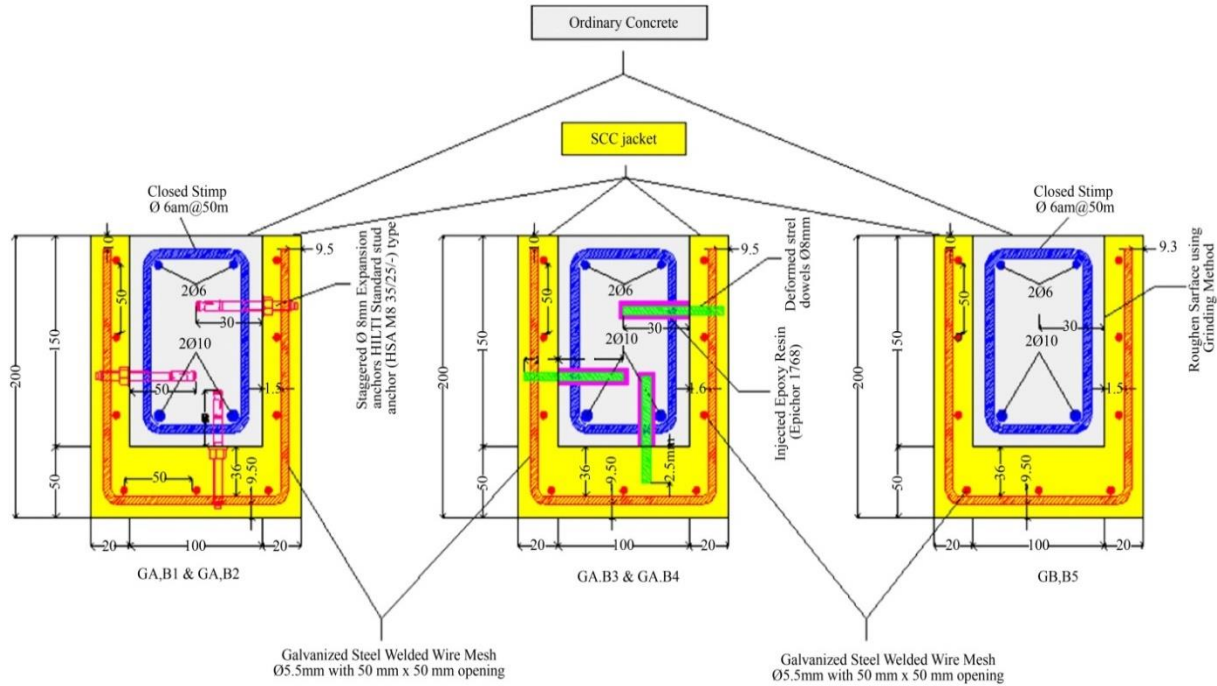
(Group B) strengthened beams (dimensions in mm) (Maraq et al., 2021)
